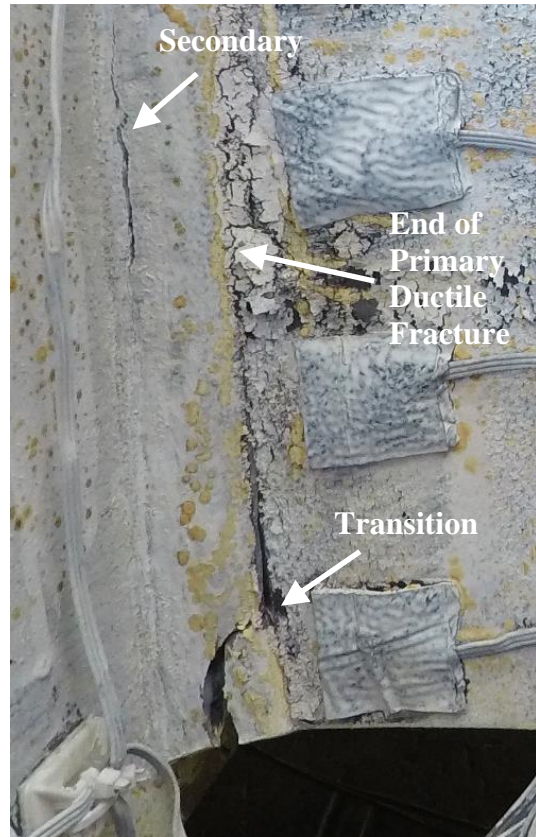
Specimen W1: East Beam Top Flange CJP Weld Fracture at -0.04 rad (2nd Cycle)
